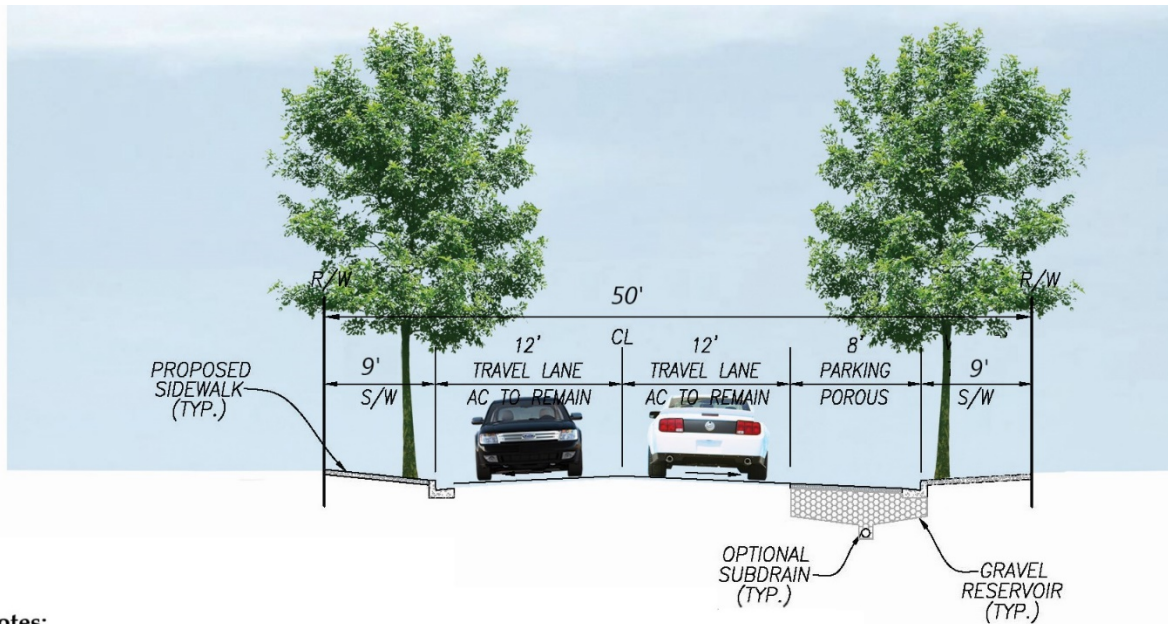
Heald Avenue Cross-Section – East of Main Street
